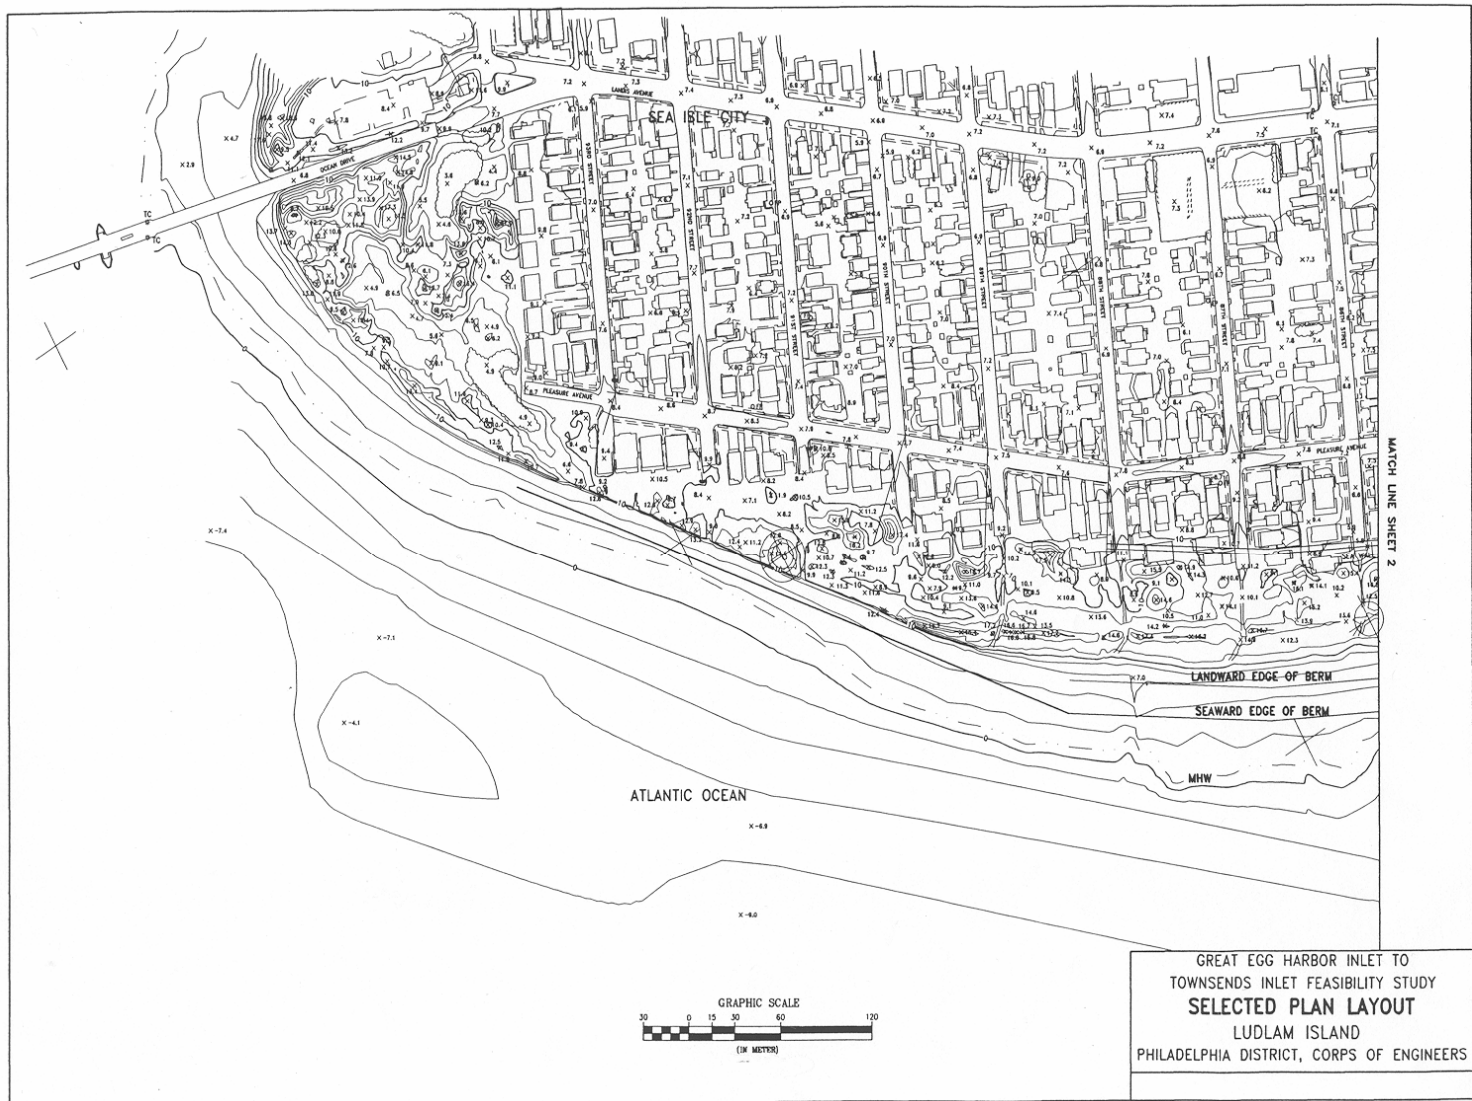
Selected Plan Layout for Ludlam Island, NJ – 76th Street to 85th Street, Sea Isle City
